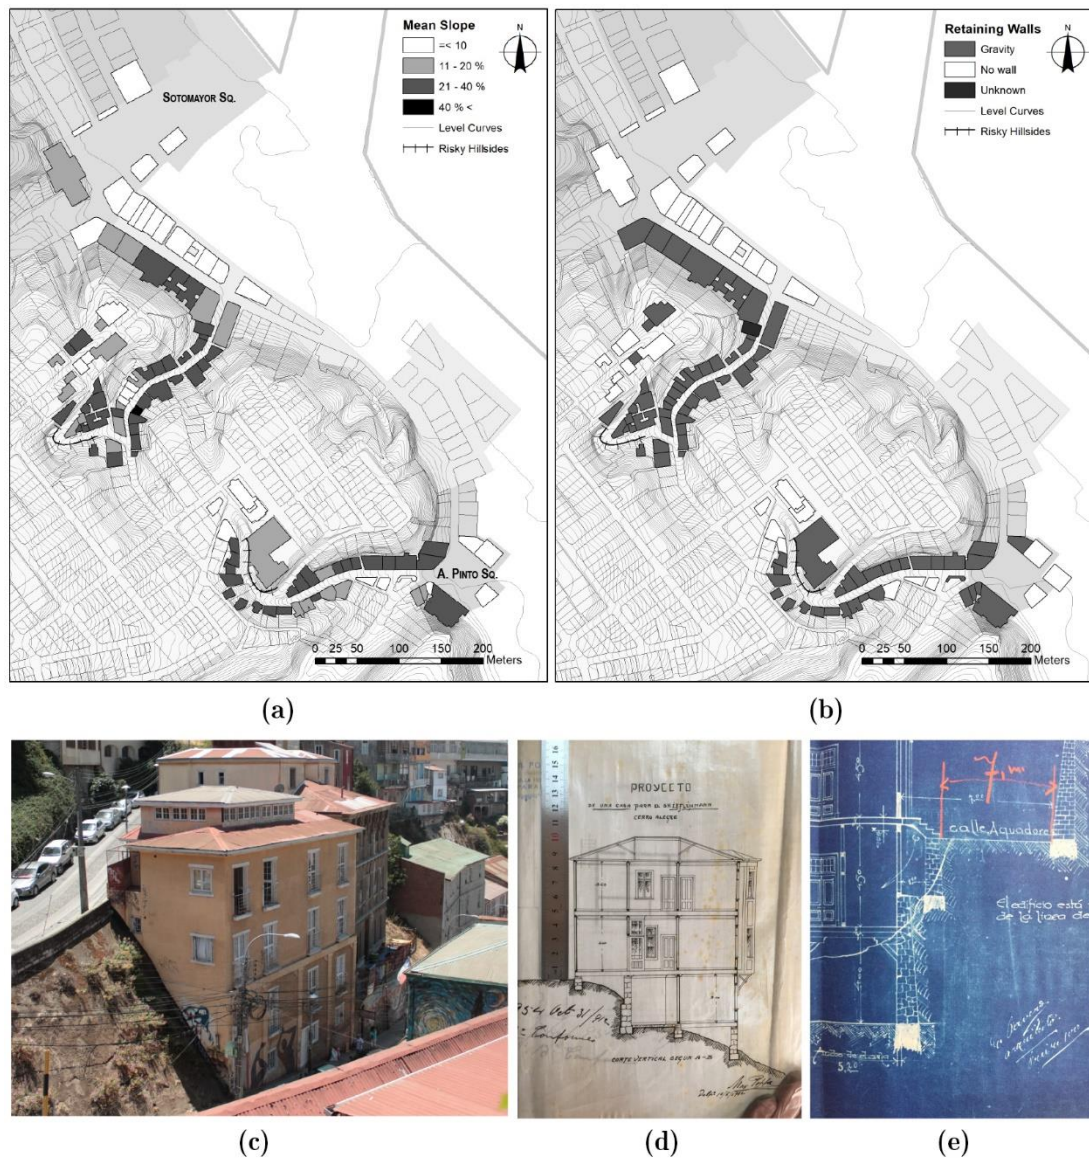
Slope and retaining walls configuration: a) GIS mapping of mean slope and (b) retaining wall typologies, (c) representative case in Almirante Montt street, (d-e) typical retaining walls and foundations.
